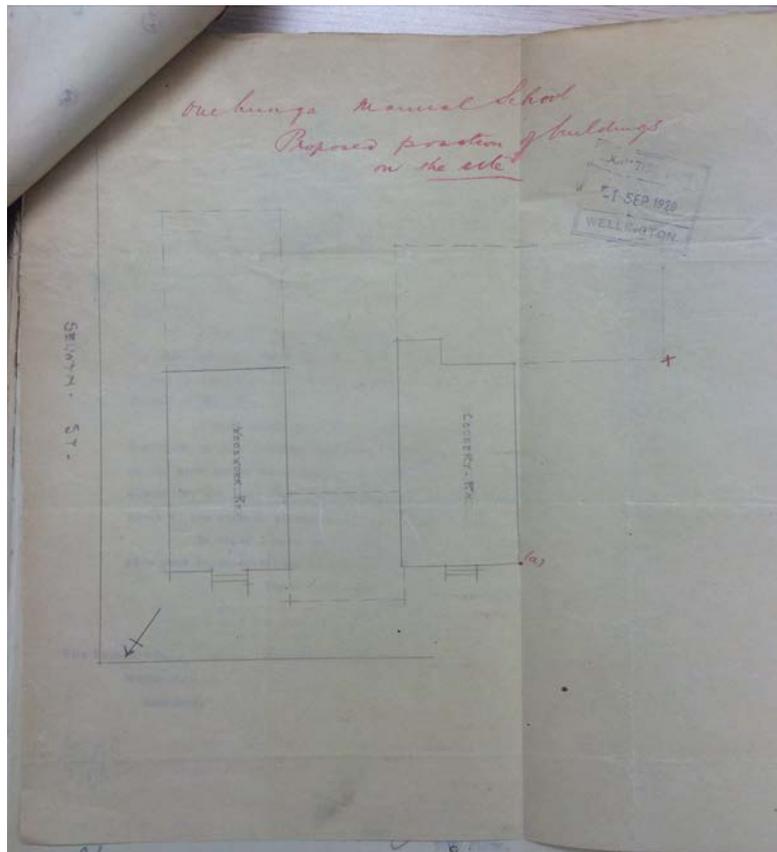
Proposed plan September 1920. Shows the two proposed buildings sitting sideways to Selwyn Street. The woodwork building is closest to the street with the domestic science building in behind. The Education Board Architect suggested this change after it was realised to implement the original design would require steps and possible excavation to reach the woodwork room door. (Education Department. (1919-1981) Buildings and Sites - Onehunga Manual Training Centre (R22887276) at Archives New Zealand)
